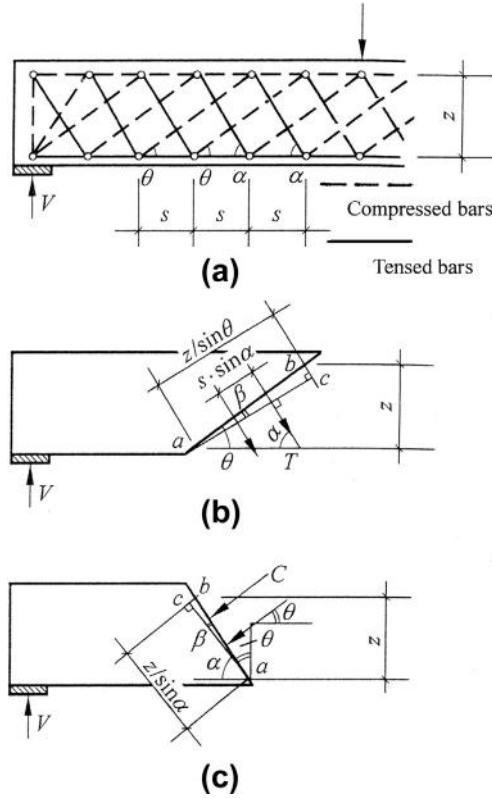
Calculation of truss model: (a) mechanical model, (b) checking web reinforcements, (c) checking compressive web bar of concrete
